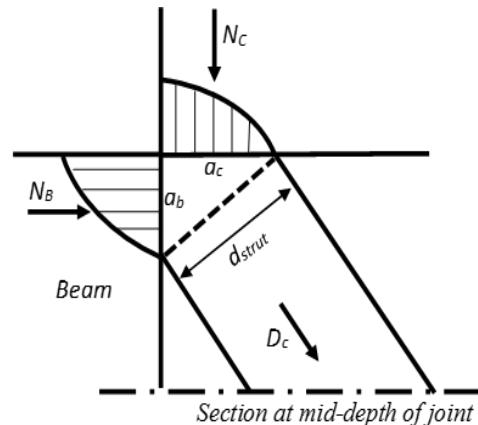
Axial compressive forces from beam (NB) and column (NC) to form diagonal strut
